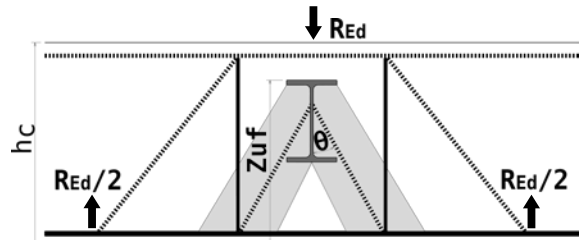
Strut and tie model for the indirect support of a steel beam inside a concrete beam.
